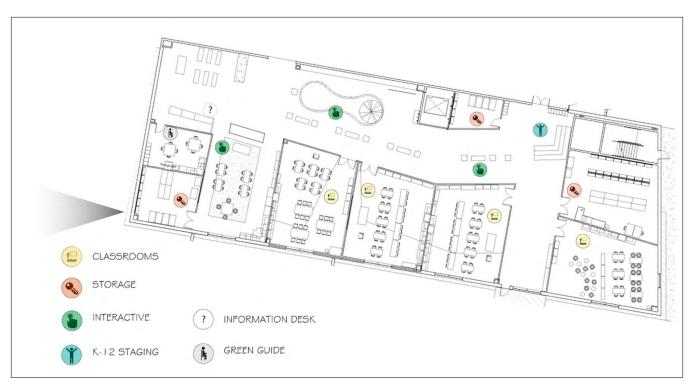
The 10-degree-leaf-vein-inspired floorplan (Source: Li P., Newland K., Courington S., 2018).
